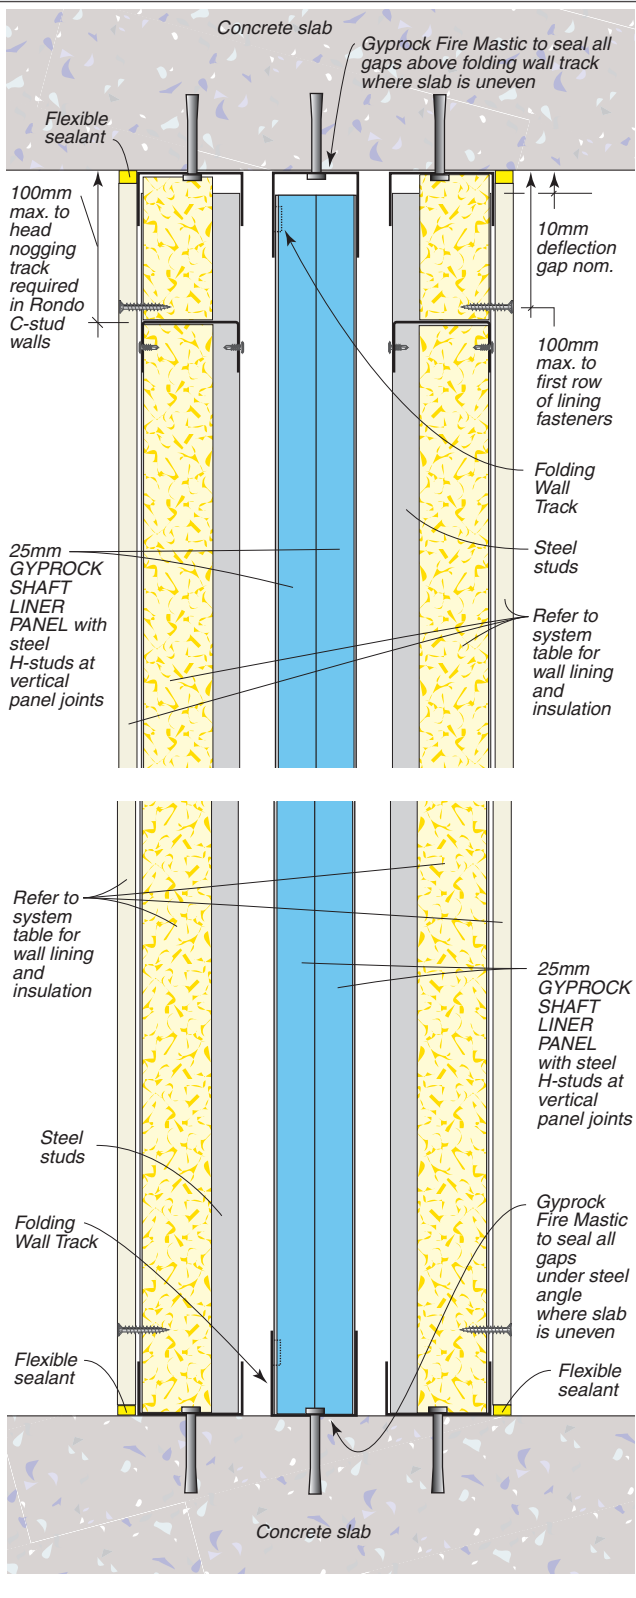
HEAD & BASE DETAIL – SINGLE CAVITY – C-STUDS ONE SIDE
